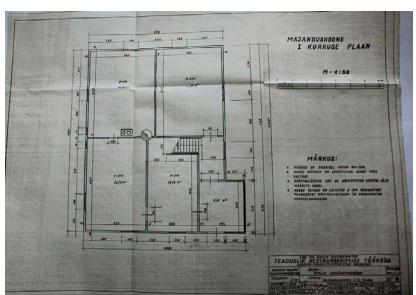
Architectural plan of the ground floor. The textile store rooms are at the left of the entrance.
